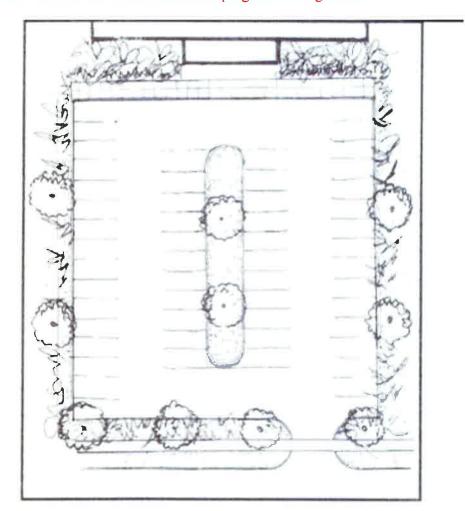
Internal and Perimeter Landscaping for Parking Areas
